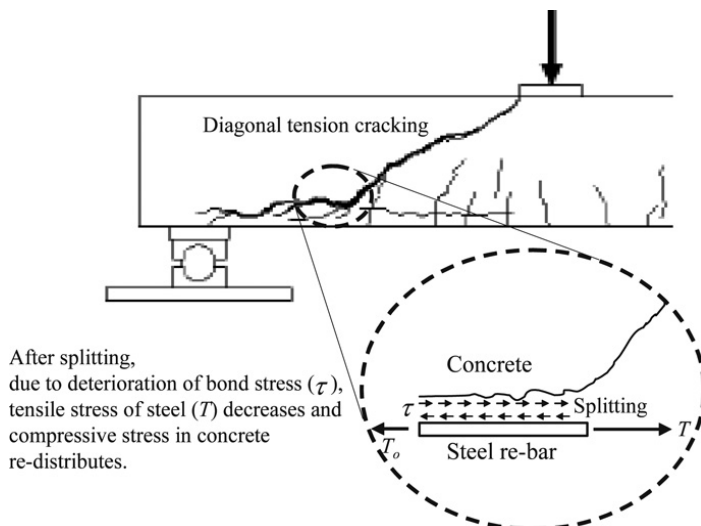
Shear failure mechanism of reinforced test beams without shear reinforcement [23]
